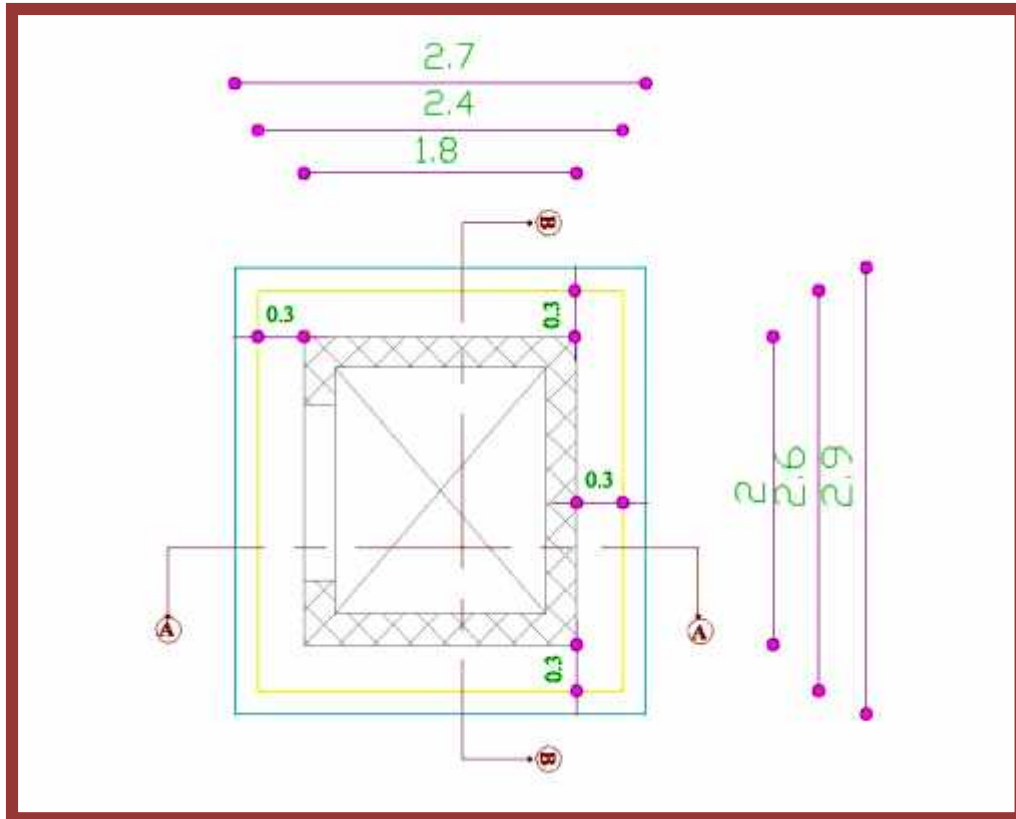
Top view of Mat Foundation(Under Elevator)
